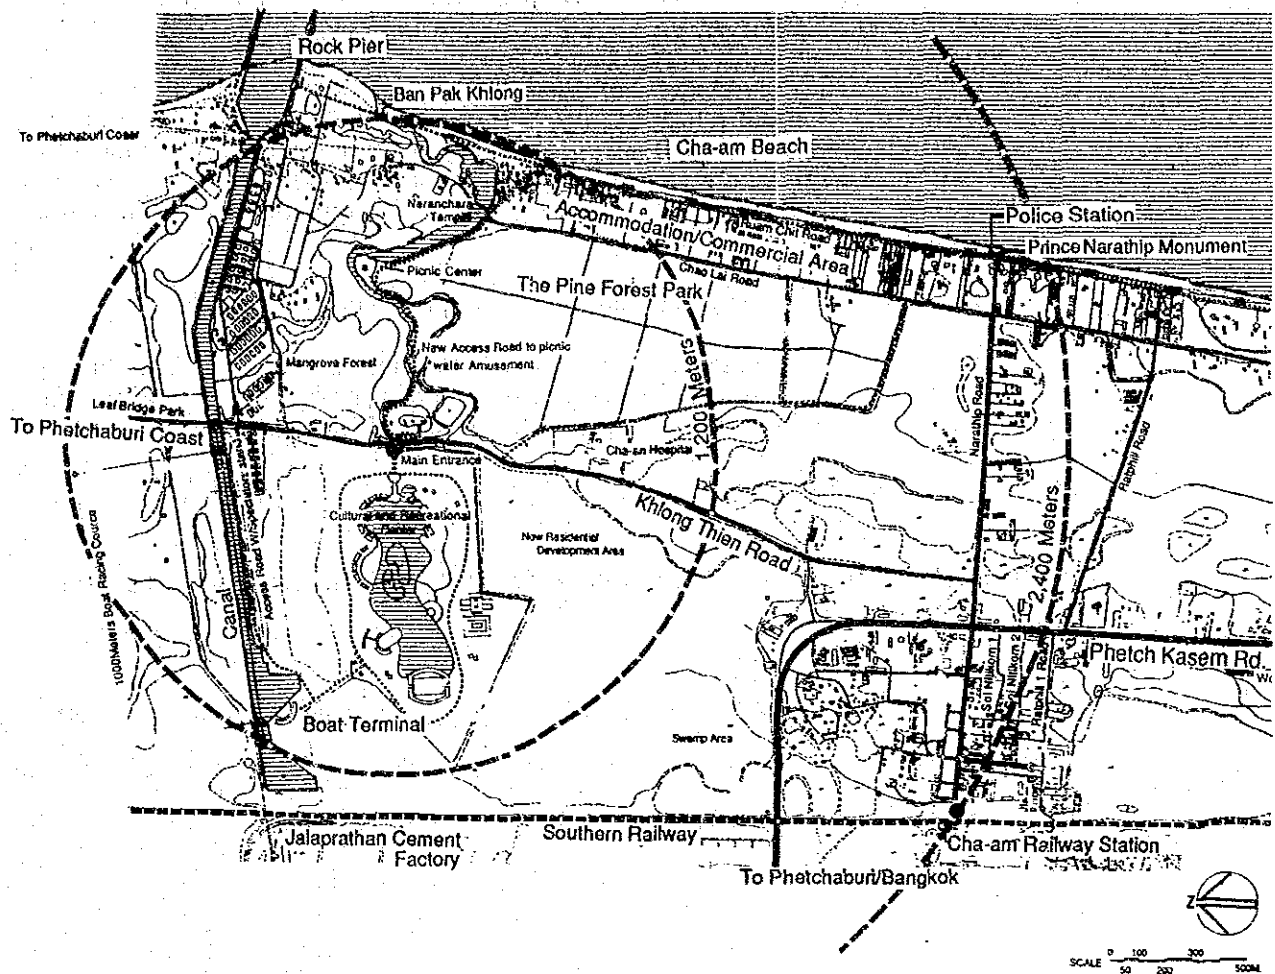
Site Plan of the Cultural and Recreational Center
